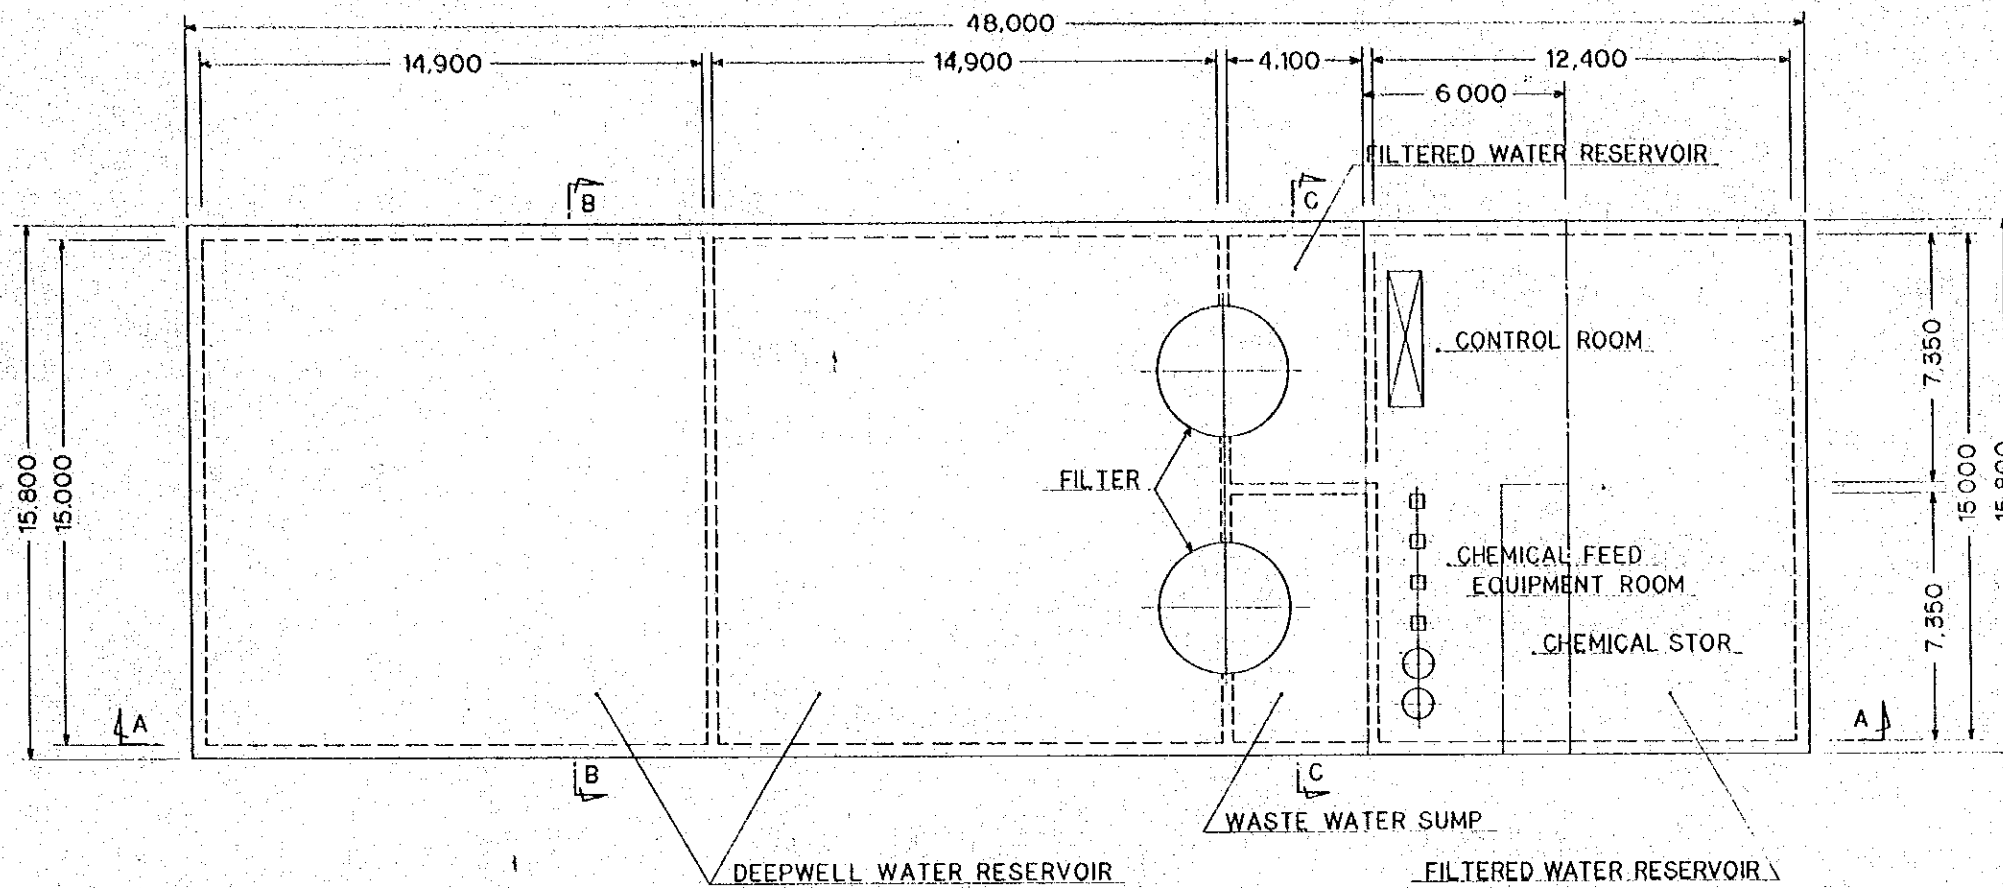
PLAN OF GROUND WATER TREATMENT FACILITY
